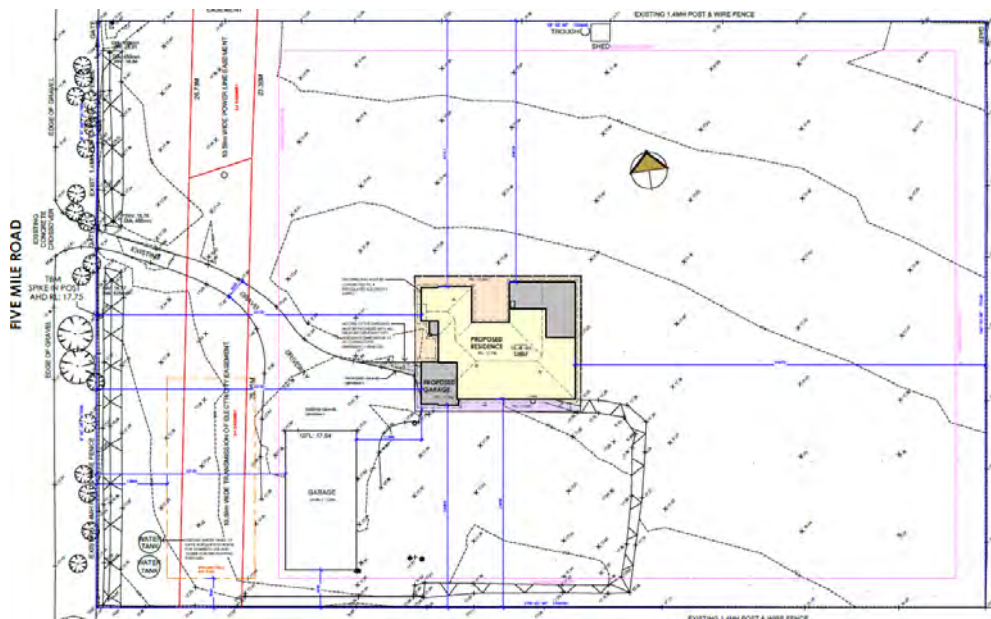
Site Plan (Hargreaves Design Group, Issue D)
